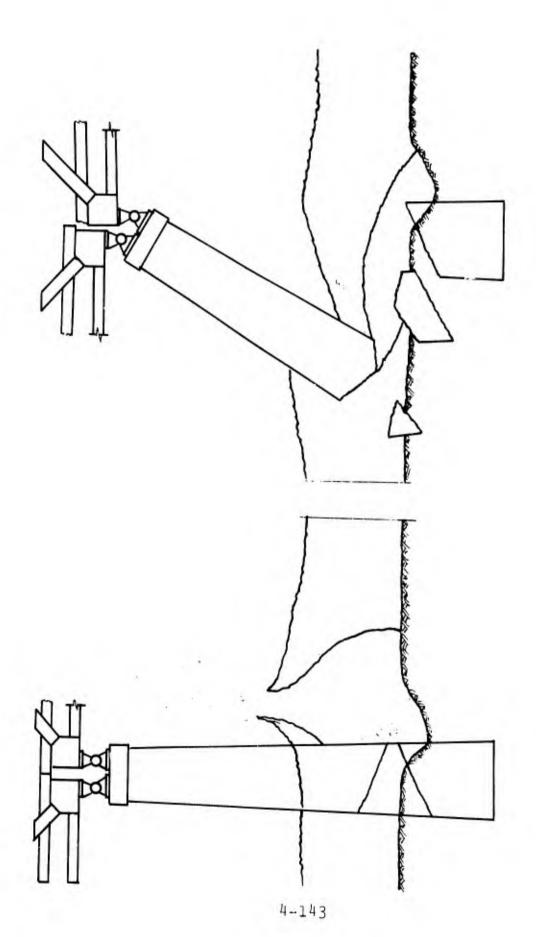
Hypothetical Demolition Failure Mode of a Bridge Pier
